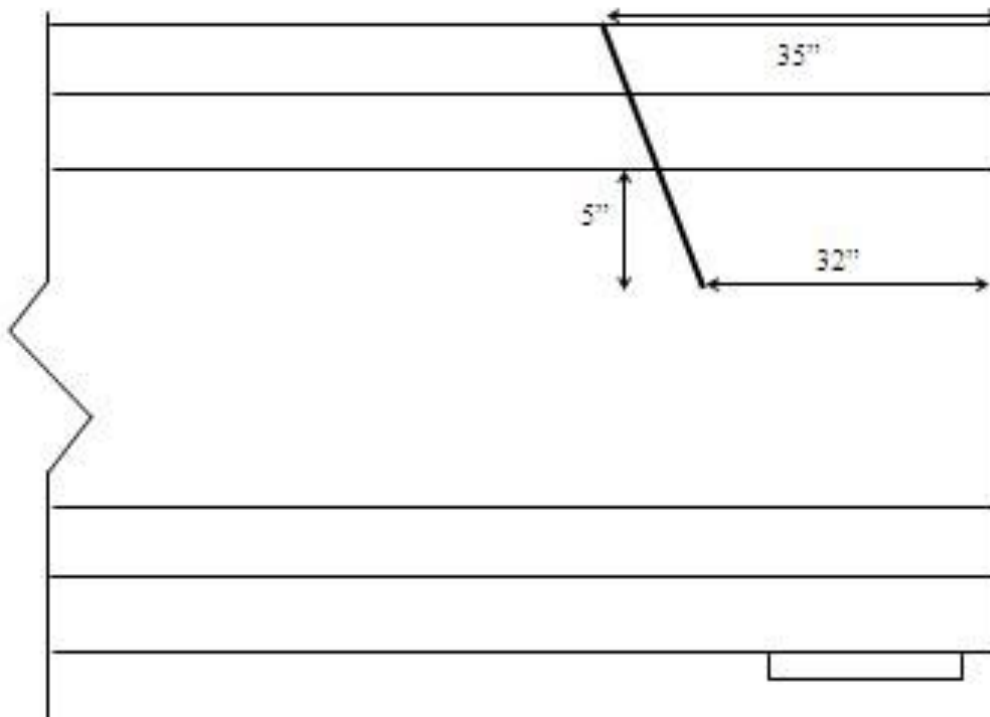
Crack diagram, exterior girder of north span, south end, east side, interior face (#7933).
